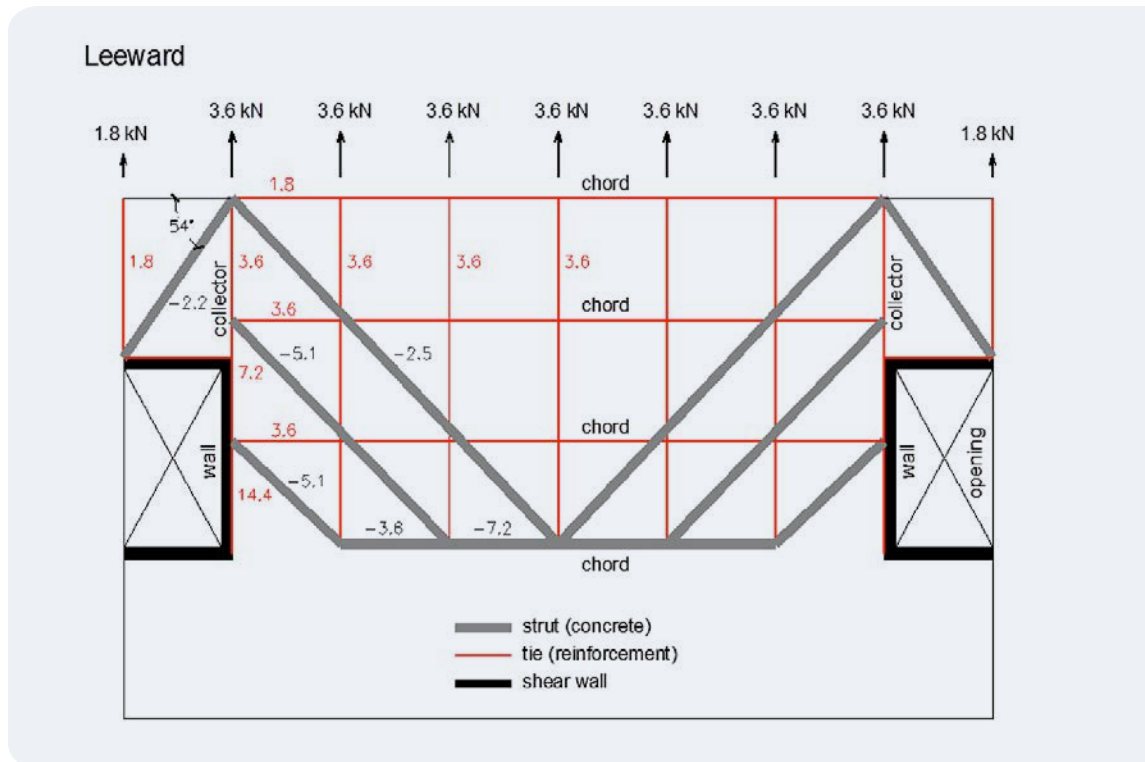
Strut and tie model for wind loads on the leeward façade.
